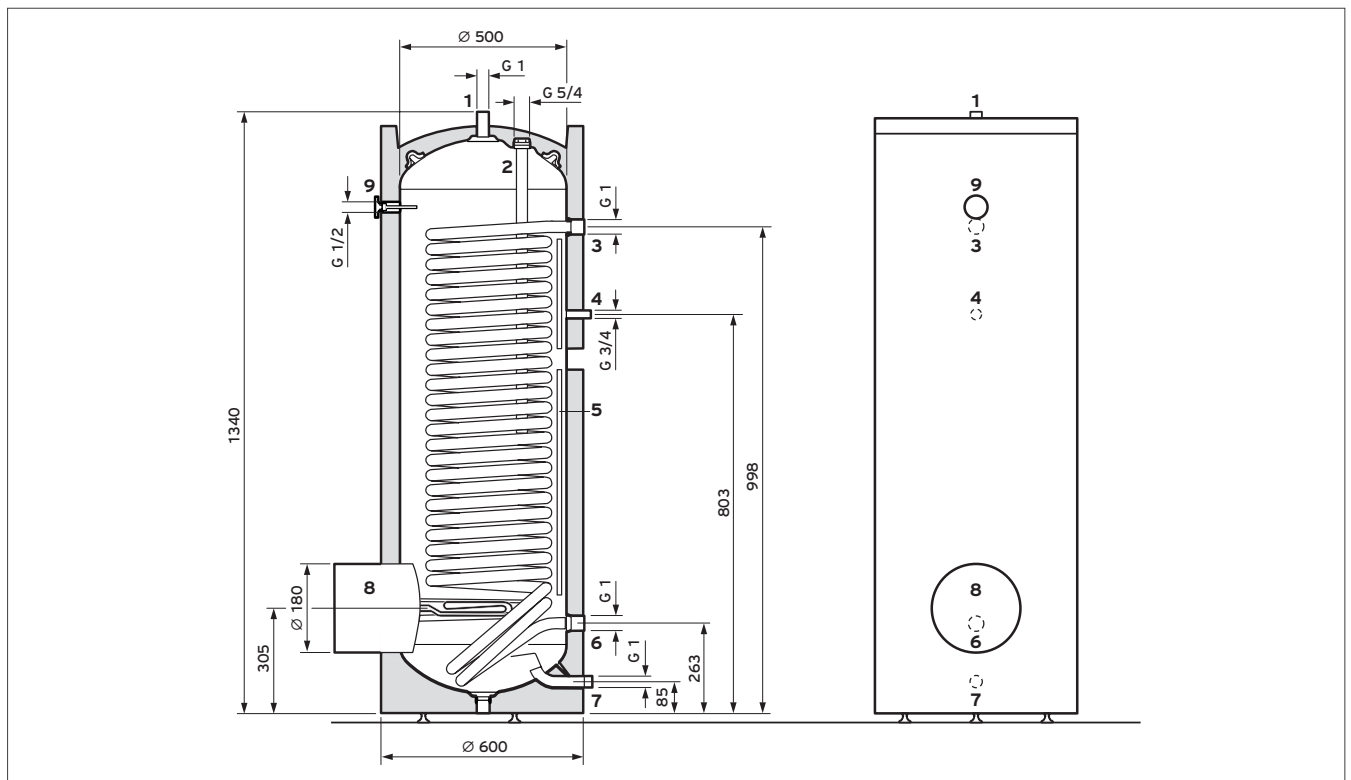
uniSTOR VIH RW 200 connection dimensions
